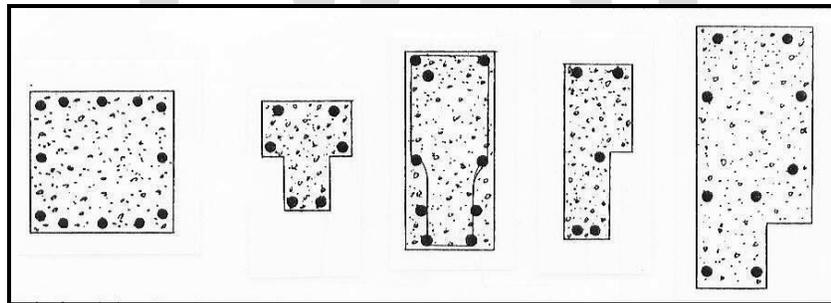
Hoist foundation plan views. Single-drum steam hoists were bolted to foundations like the one at left, and the other foundations were for various types of gasoline hoists. Source: Twitty, 2002:187, 241.
